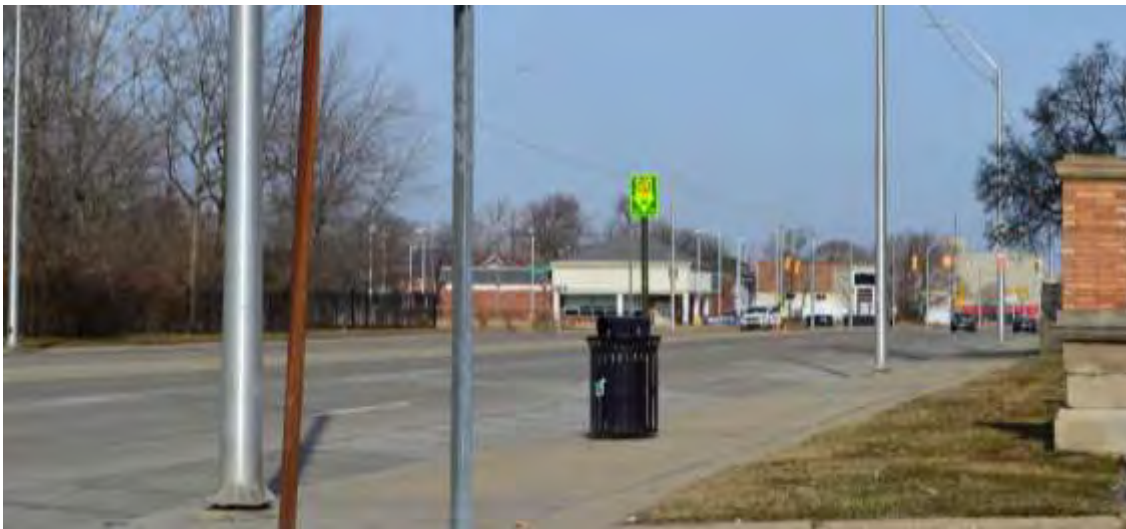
Looking northwest toward project site from East Boston across Woodward, March 2021
